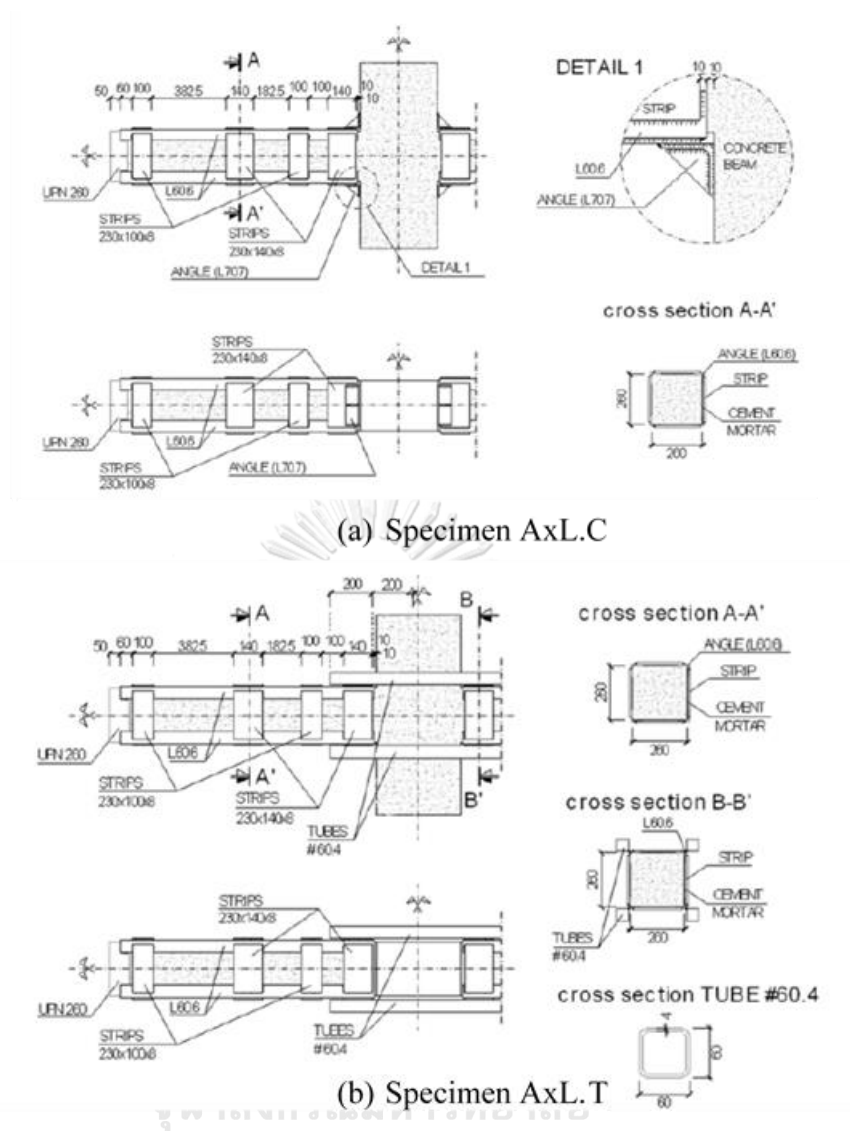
Detail of Strengthened columns (Adam et al., 2008)
